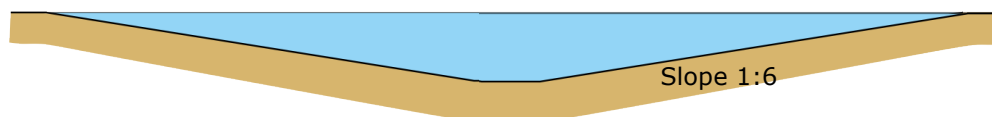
Schematic of a typical trench excavated using a backhoe dredger.
